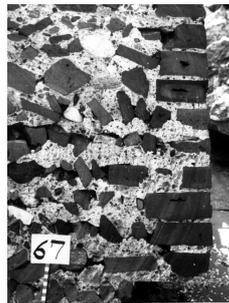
Multiple-leaf masonry of the Tower of Pavia.
